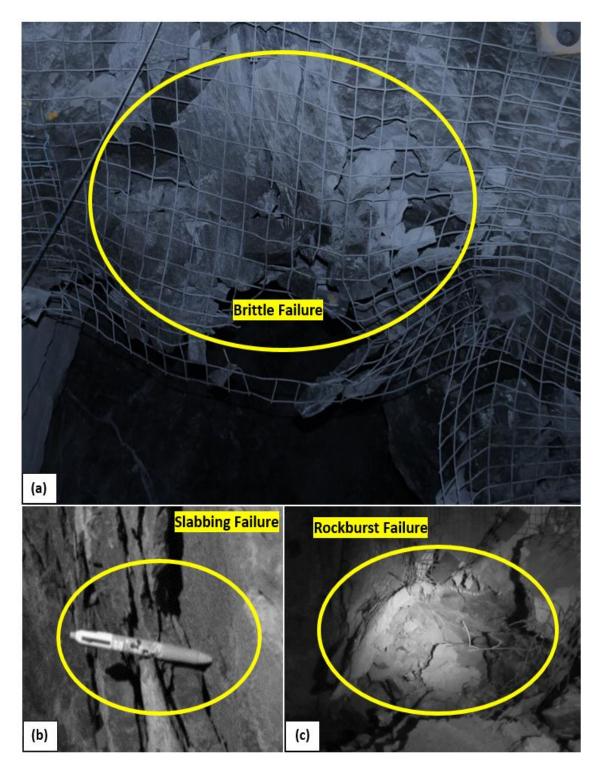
Observed failure modes at the mine; (a) brittle failure, (b) slabbing failure, (c) Rockburst failure
